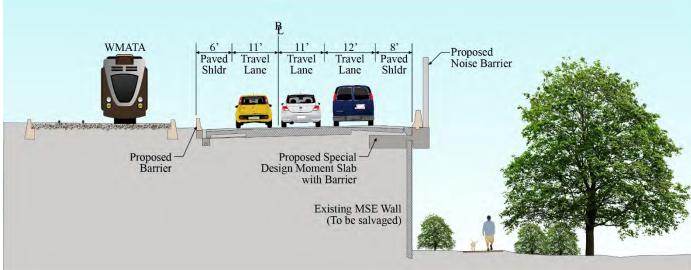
D-1: Existing retaining wall adjacent to Custis Trail.
